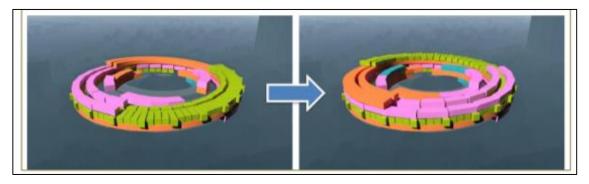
Vertical adding of a new floor source : (http://www.eiffage-phosphore.com.)
